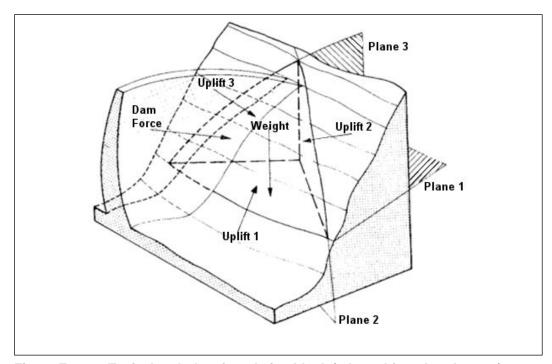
Typical arch dam foundation block (adapted from Londe 1973).
